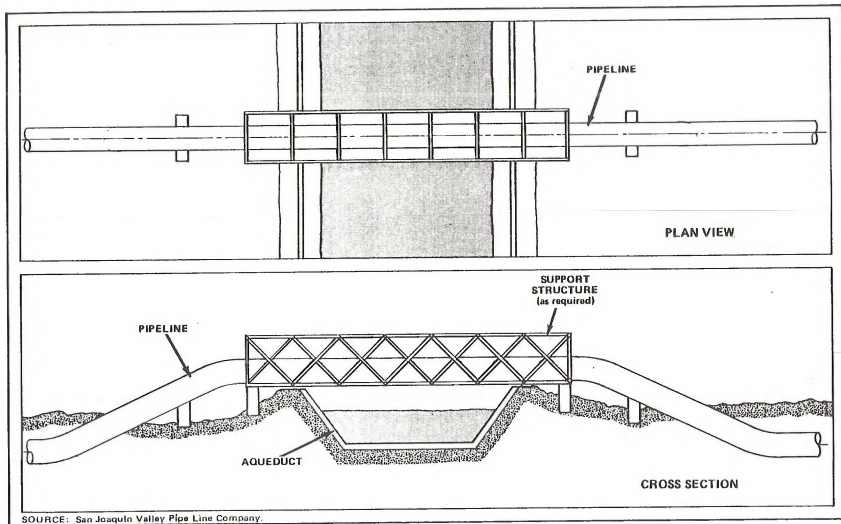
TYPICAL ABOVE-GROUND AQUEDUCT CROSSING
